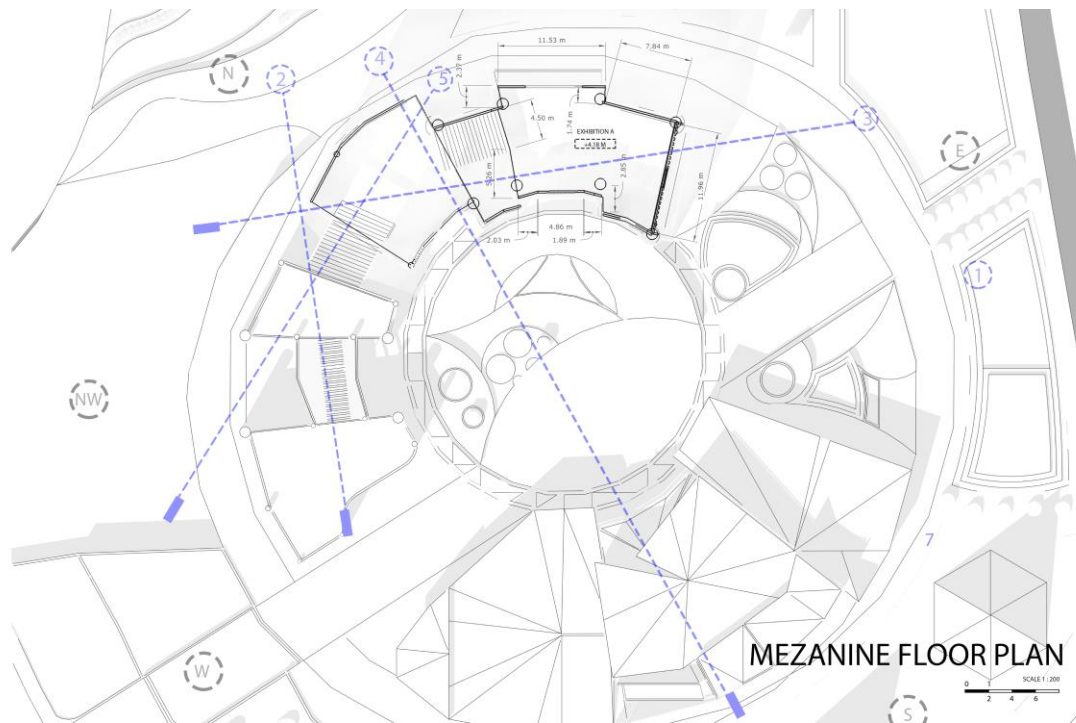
Mezanine Floor Plan (Source: author analysis)
